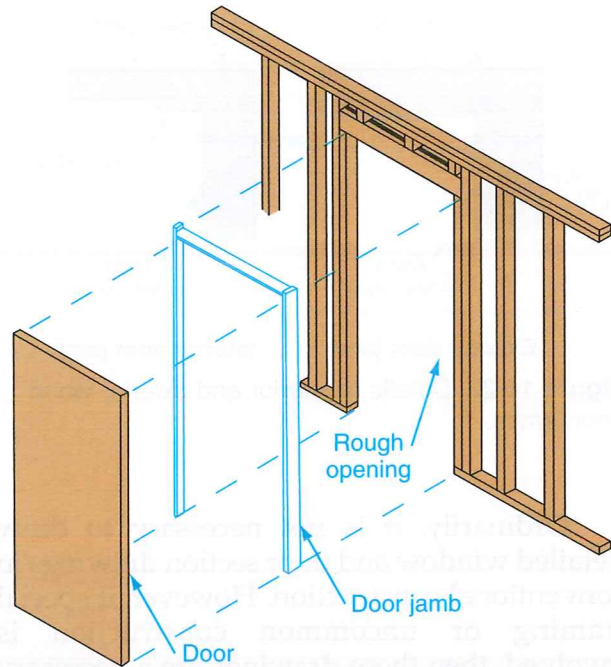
The door jamb fits inside the rough opening and supports the door.
